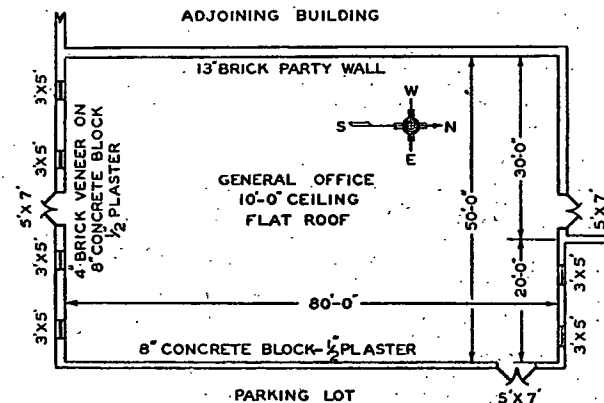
PLAN OF ONE-STORY OFFICE BUILDING
